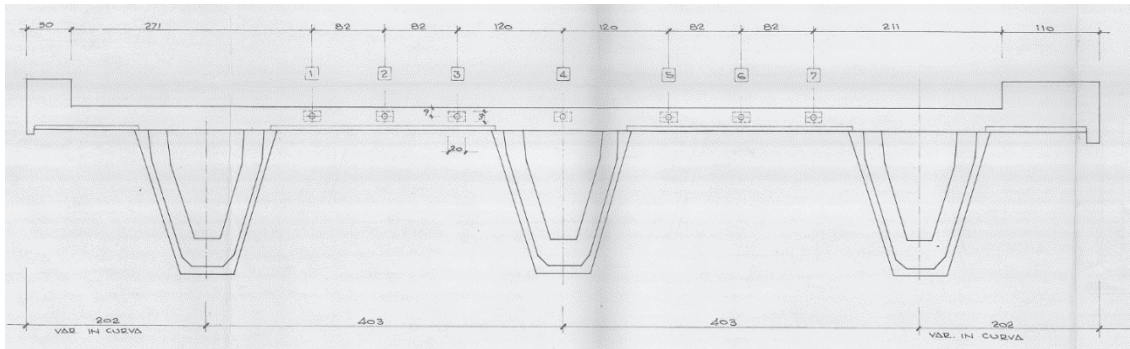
Pre-stressed concrete deck cross-section. Source: design project of the road links among SS76 road, A14 highway, Falconara airport and SS16 road, ANAS, 18.02.1986.
